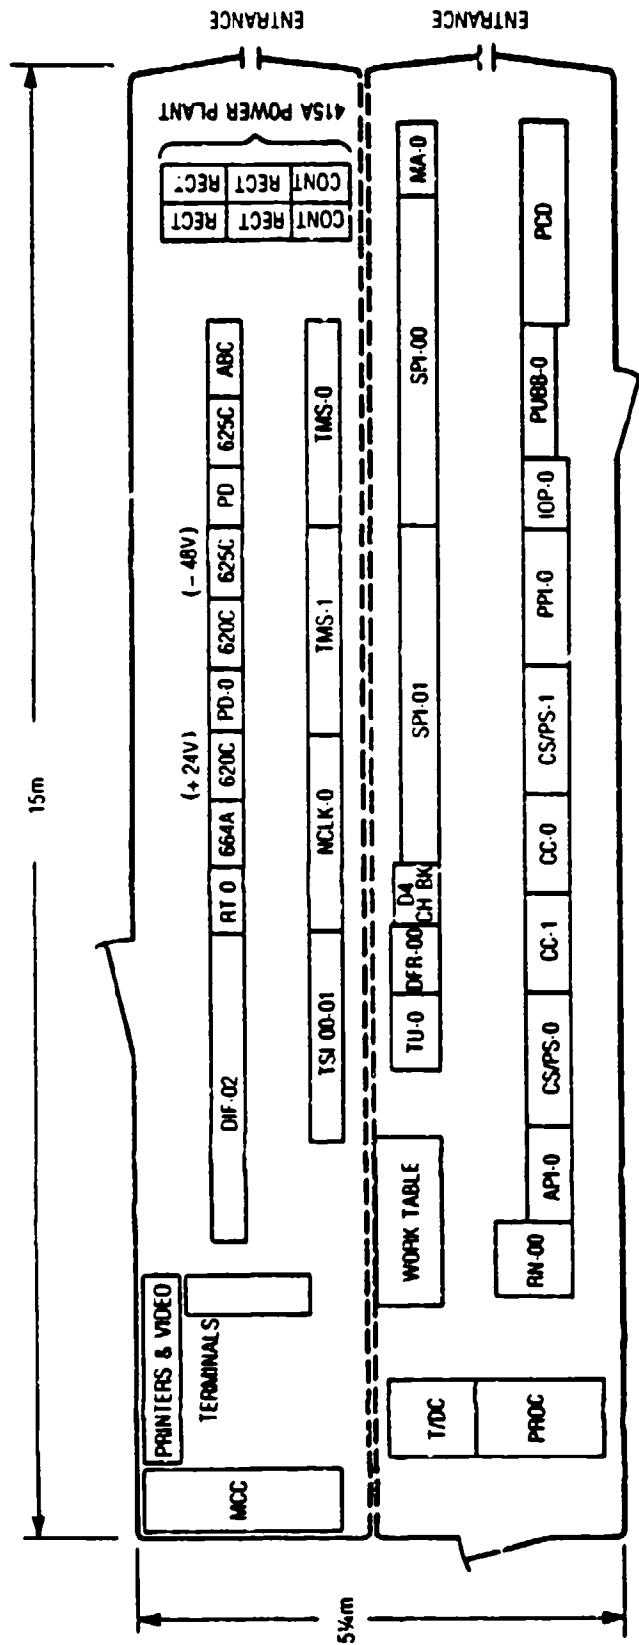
Floor plan of the 4 ESS Switch test trailers.
